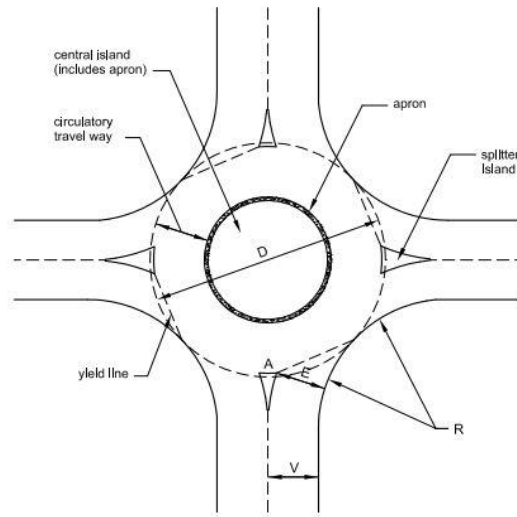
Geometric Elements of a Typical Roundabout (BC Supplement to TAC Geometric Design Guidelines)
